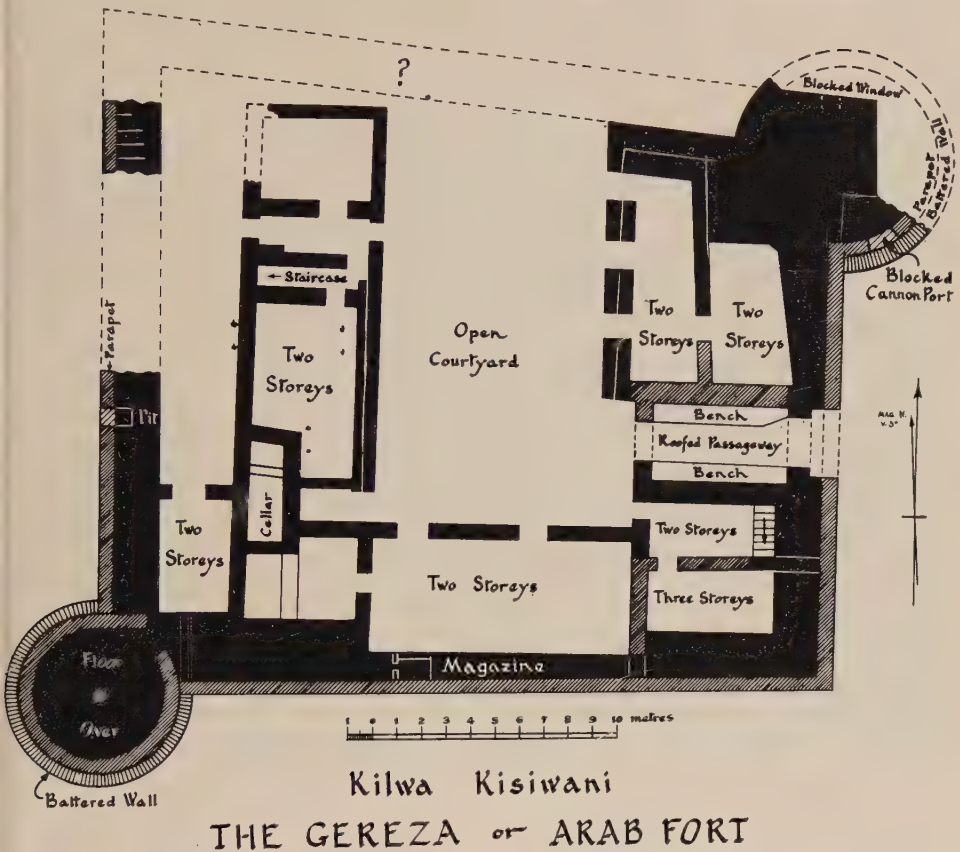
Plan of the Gereza. Adapted and corrected from a German survey made in 1904.
